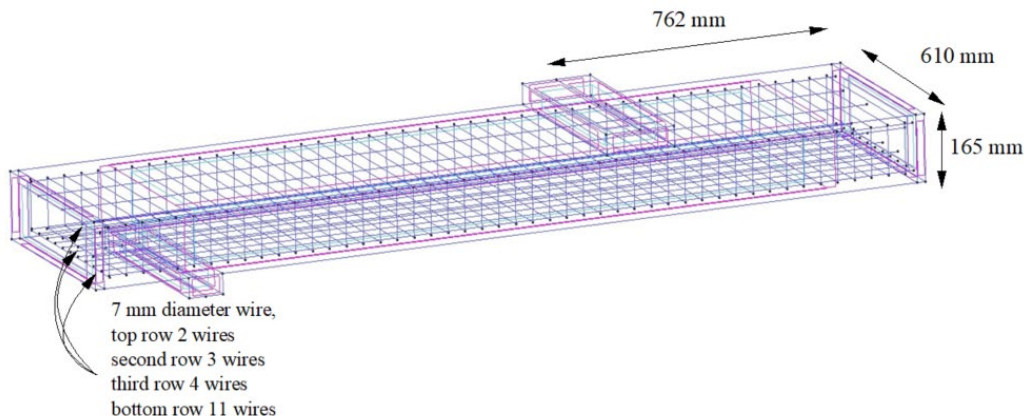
Geometry and details of the prestressing wire and loading point.
